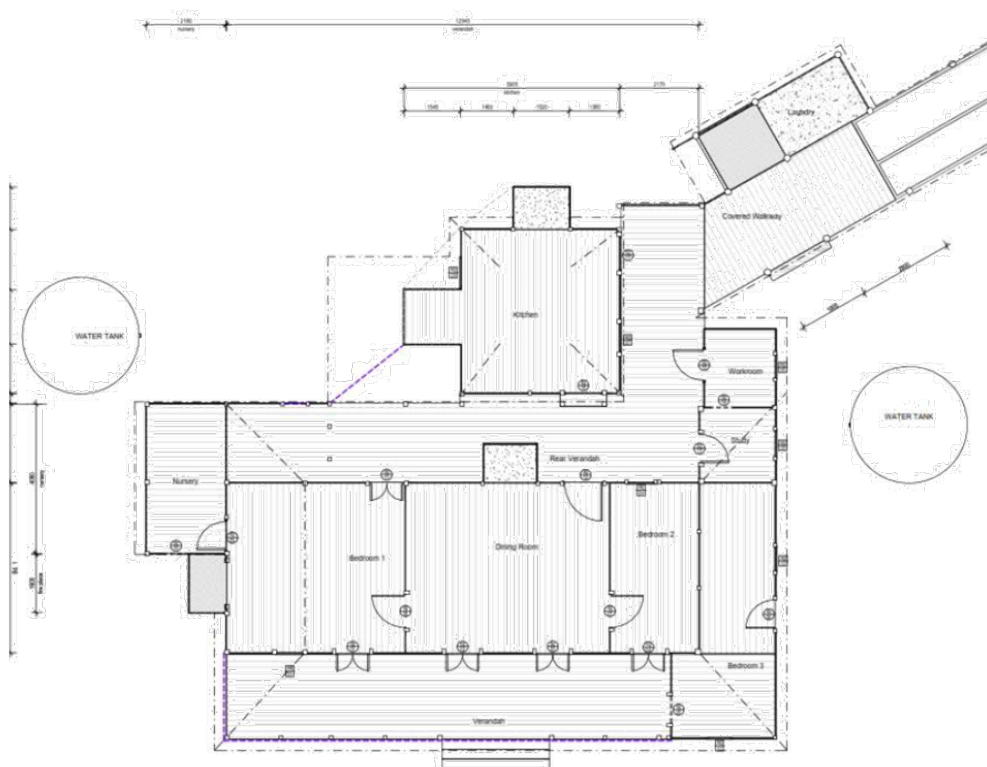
A floor plan of the main homestead building. *Source:* Extract from drawing 21602EX A200, Issue P1, prepared by Gibson Architects (2021).
